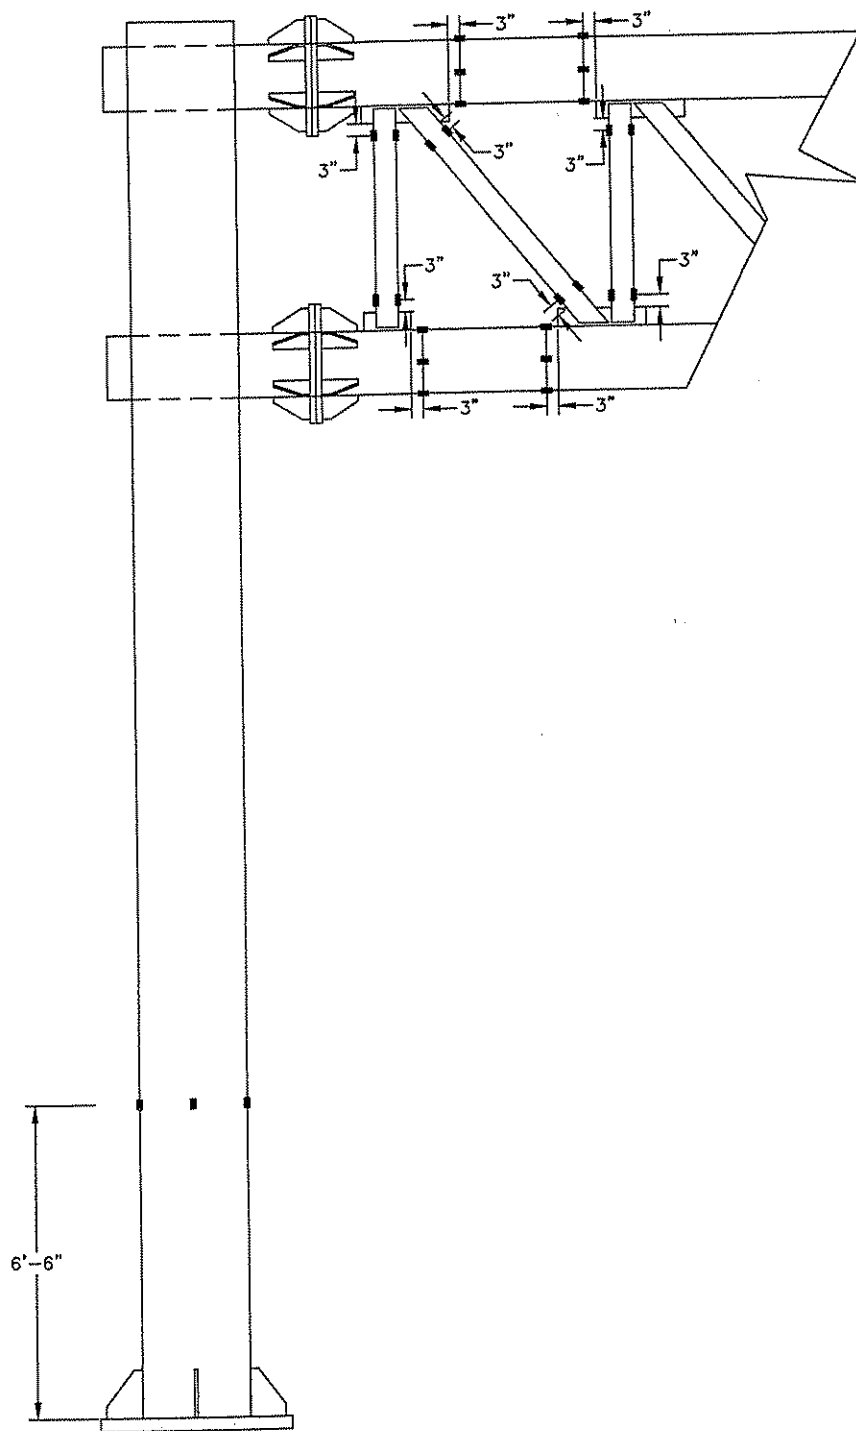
Improved Strain Gage Layout for Future Monitoring.
